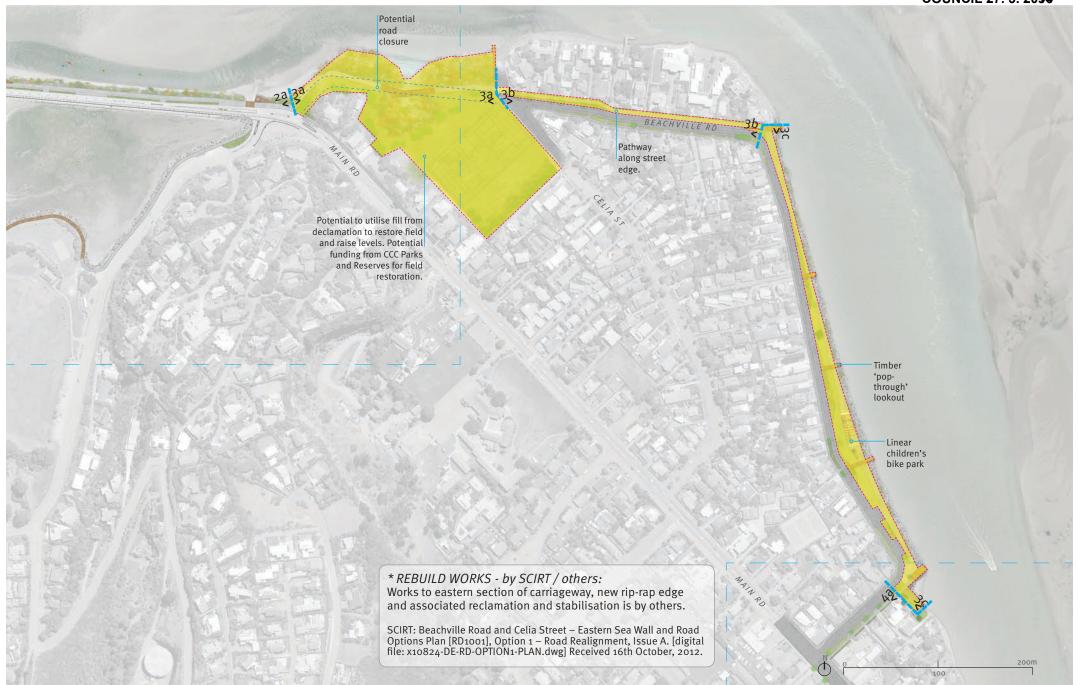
Redcliffs: Beachville Road plan with areas of costed works identified.
